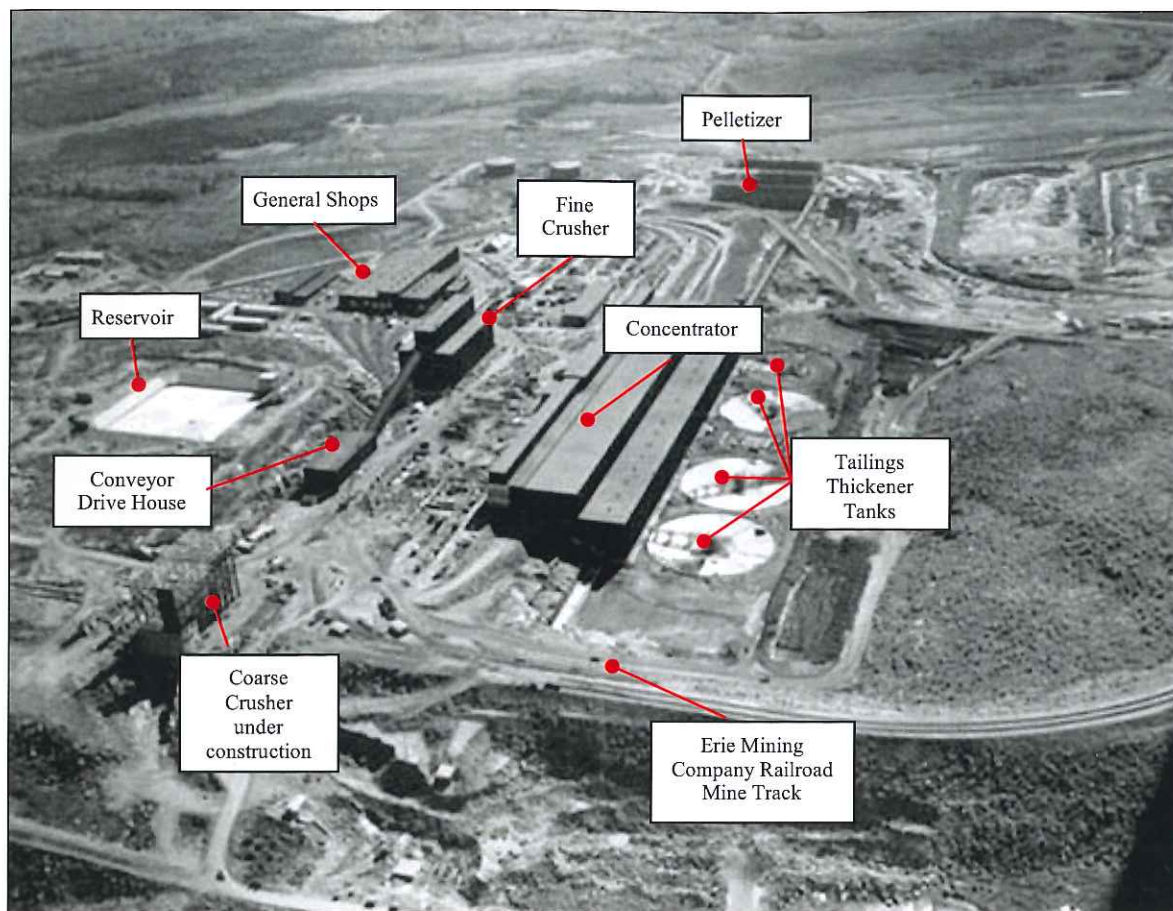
Erie Mining Company site during construction, looking south, ca. 1956.
